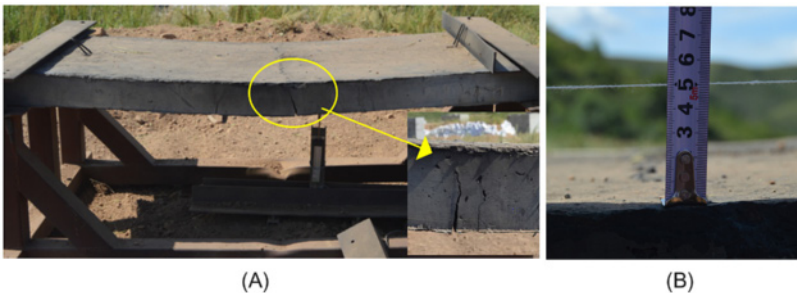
UHMWPE-2 fiber-reinforced concrete slab after 12 kg TNT detonation from 1.5 m standoff distance: (A) slab flexural crack and (B) residual deflection.
